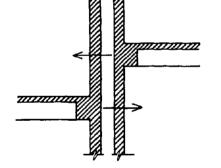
Stiff elements, such as floor slabs, not adjacent to each other, will produce more severe damage.
